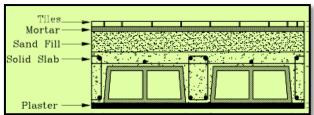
Typical Cross-Section D. L. Calculation, Finishes
